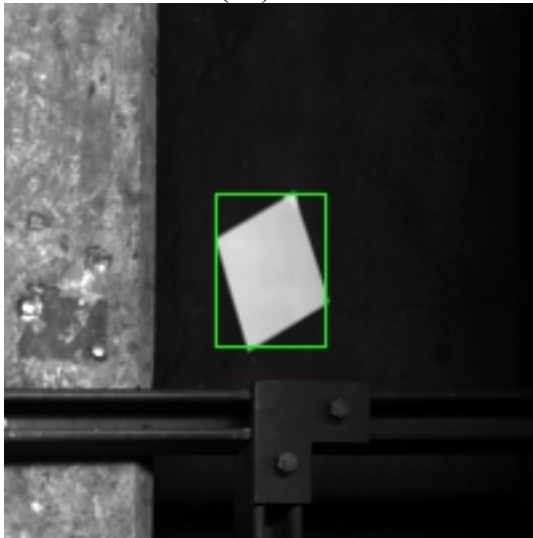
Inspected defects in the underground section. Down direction left rail (II).
